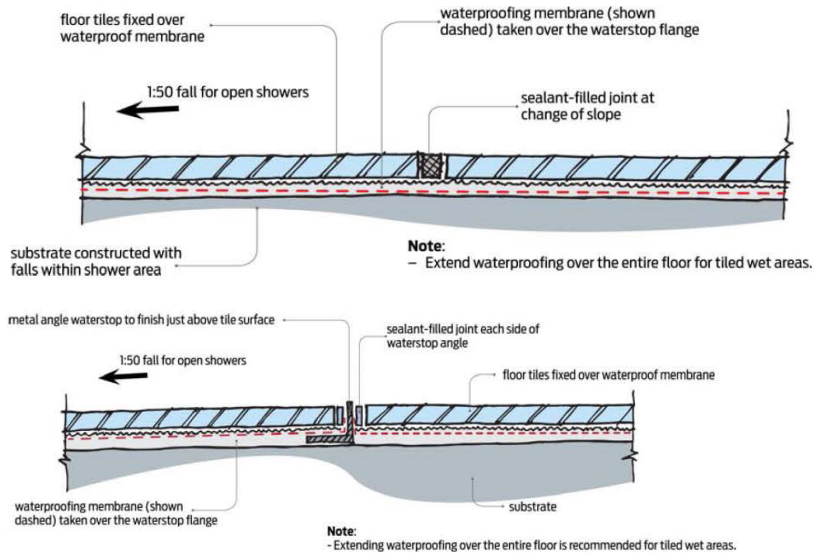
Wall and Floor Coverings to Unenclosed Showers
